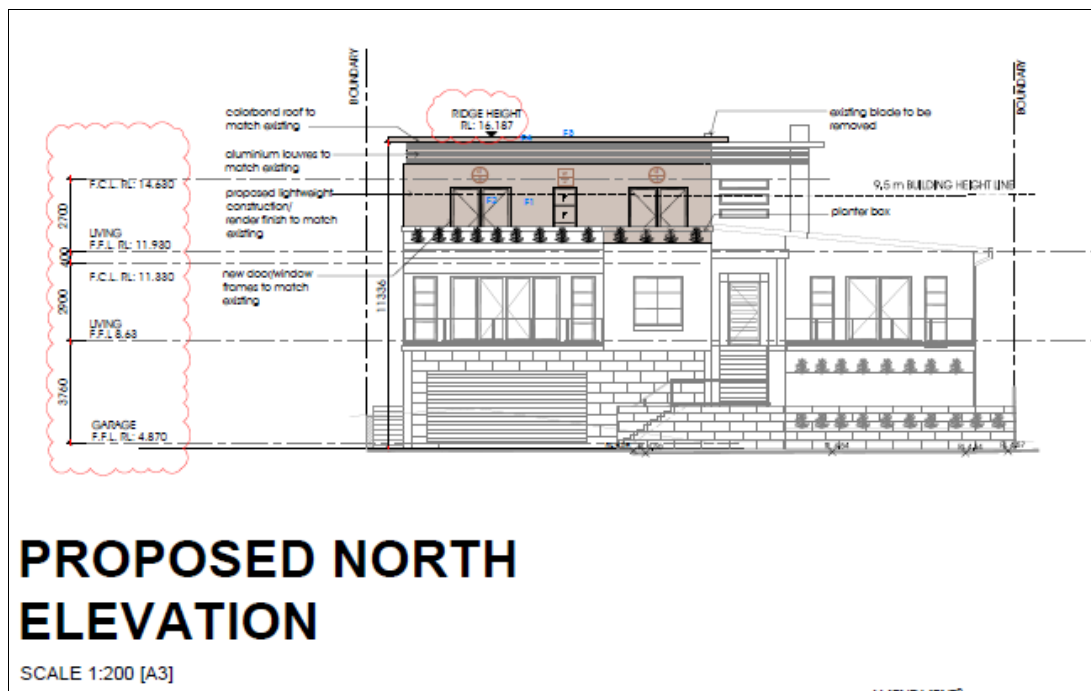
to 6 below are the first floor plan and elevations of the proposed first floor additions.
